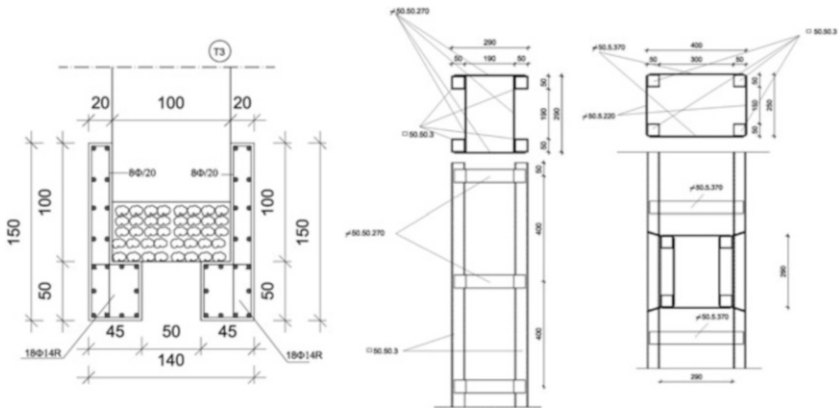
Details of the foundation and of the horizontal and vertical steel ties
